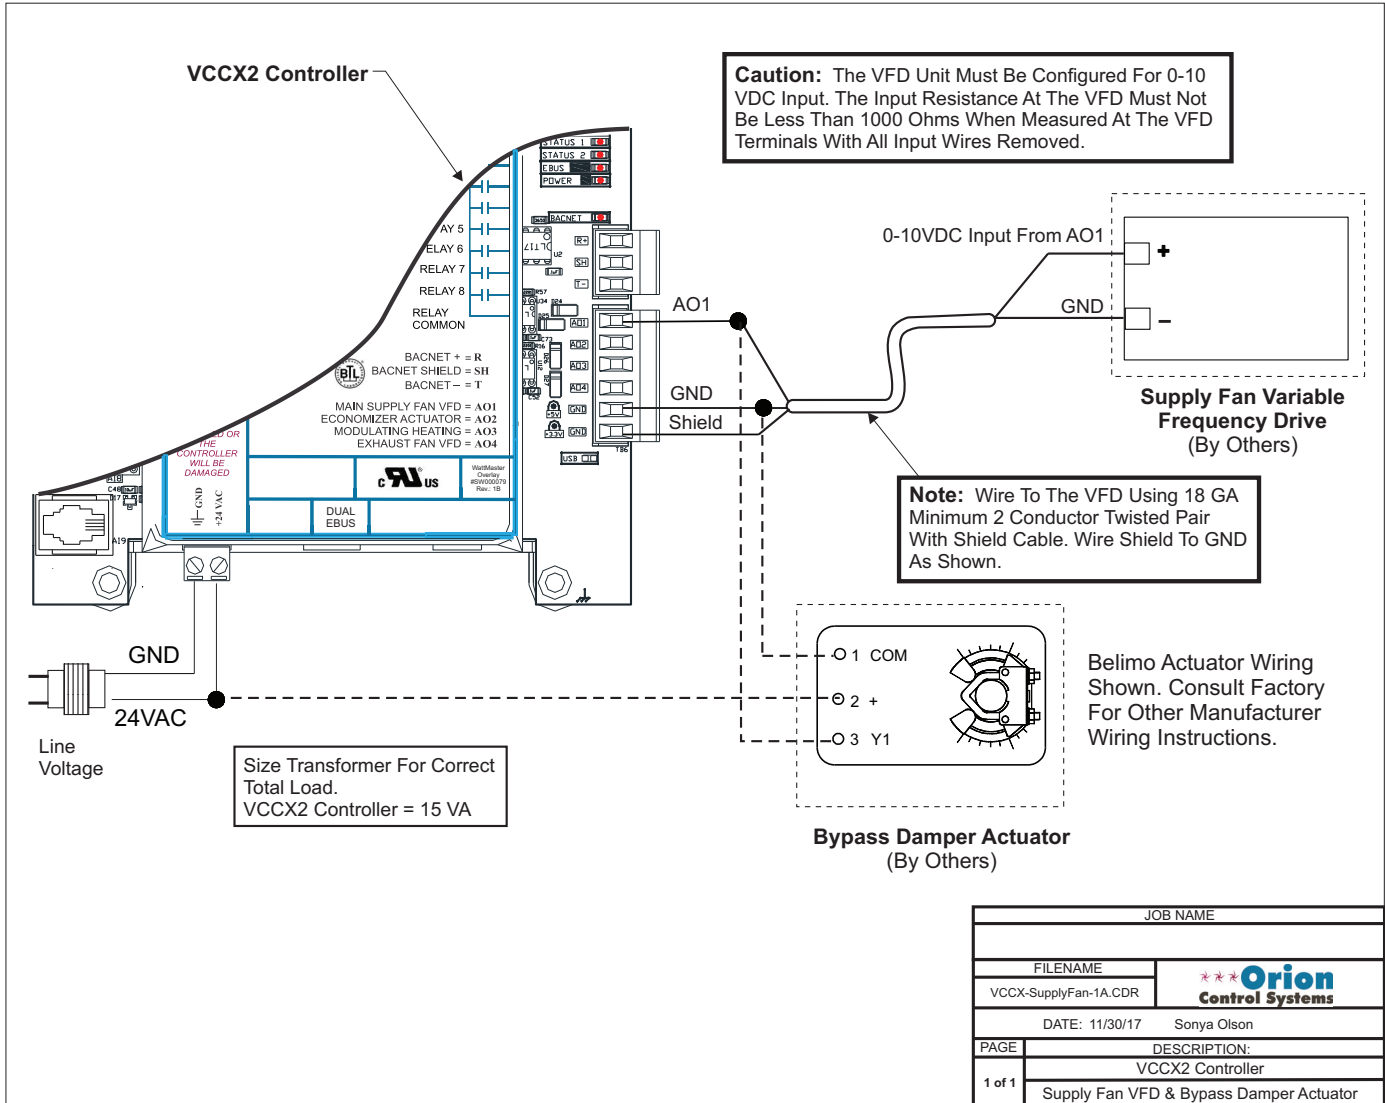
Supply Fan VFD & Bypass Damper Actuator Wiring
